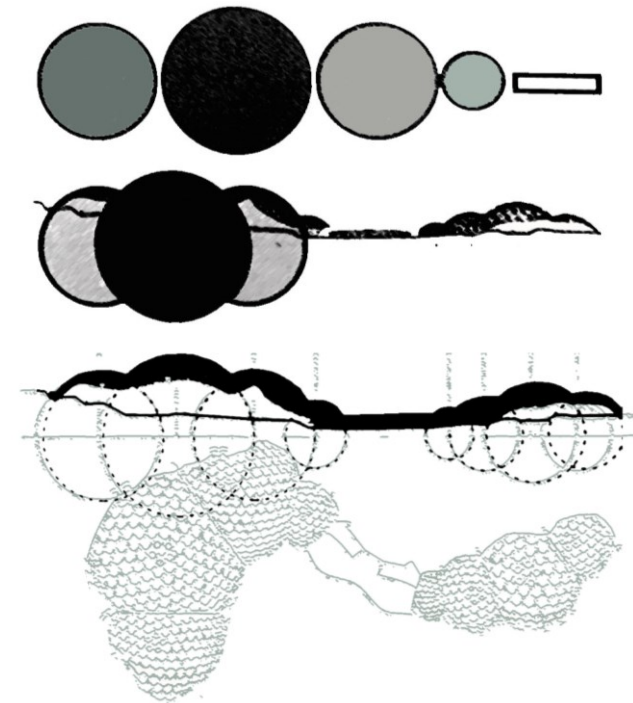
Sketch of section to plan development generated from (Grimshaw: online)
